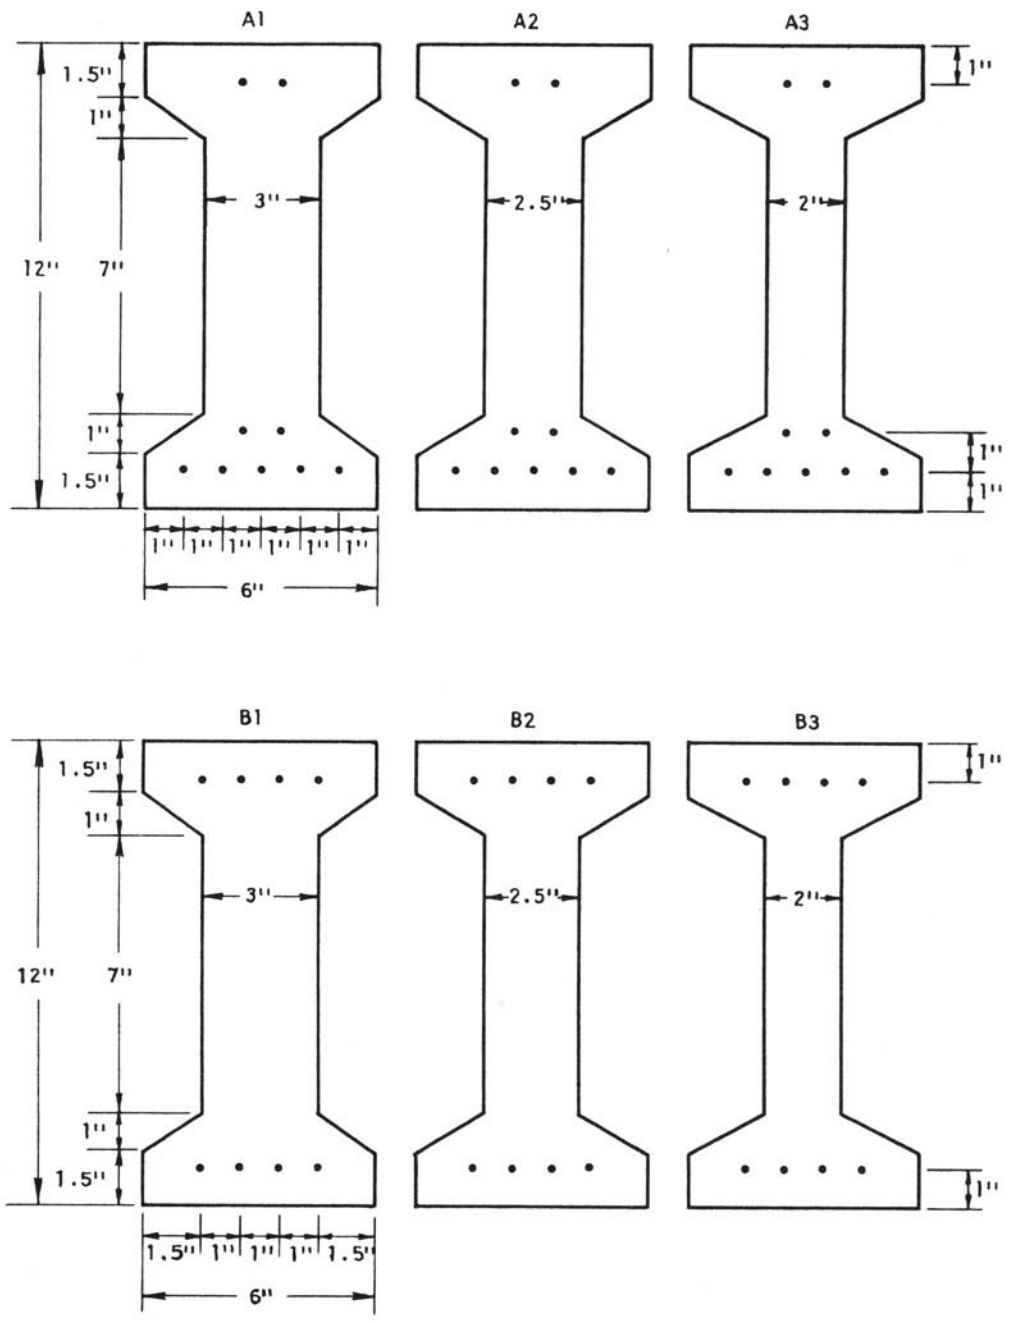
ARTHUR AND GANGULI, BEAM CROSS SECTIONS
